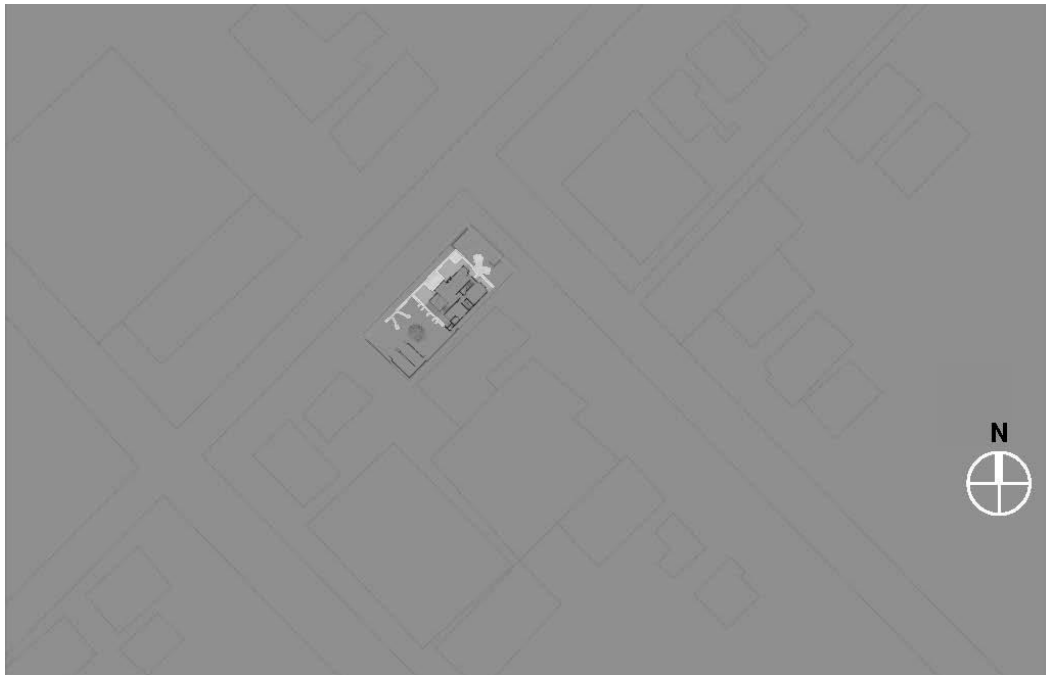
Gehry's 1977-78 Santa Monica Residence; the site plan.
